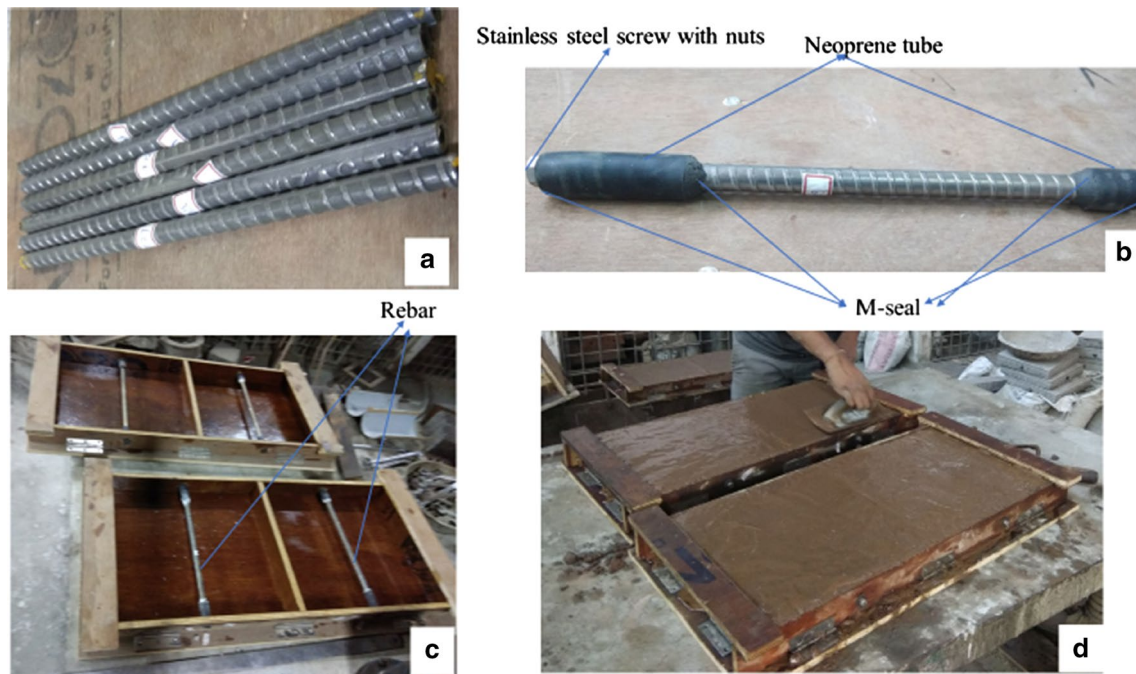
The picture of a Rebars after cleaning as per ASTM G109-99a [20], b Rebar prepared to place in concrete, c Slab specimen molds with rebars at center d Casting of reinforced slab specimens
